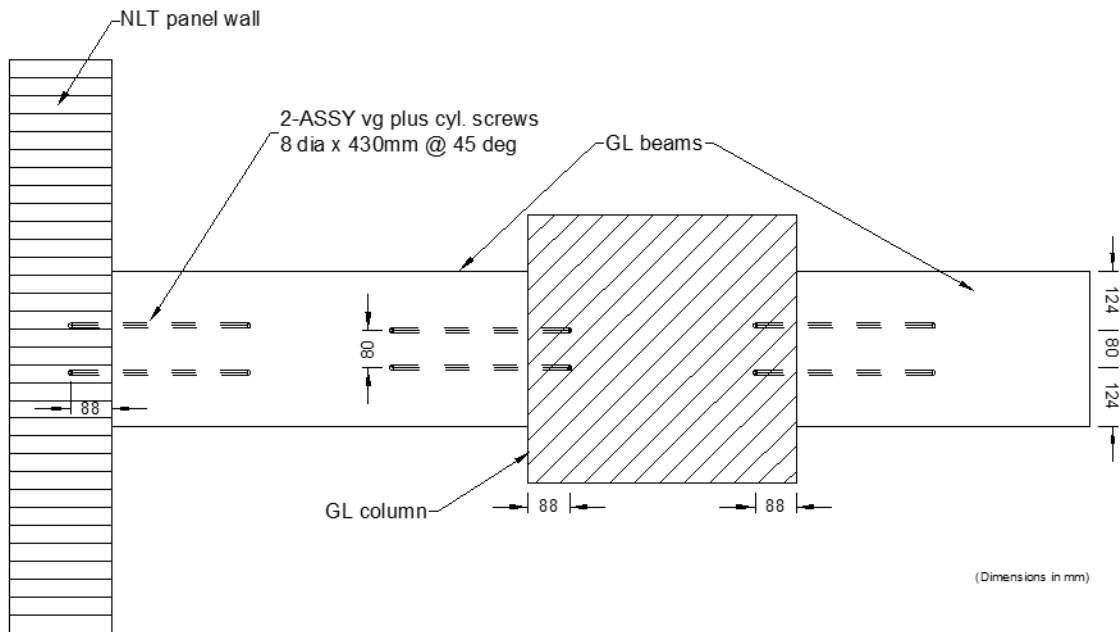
Connection details of Glulam beams and columns and NLT panels.
